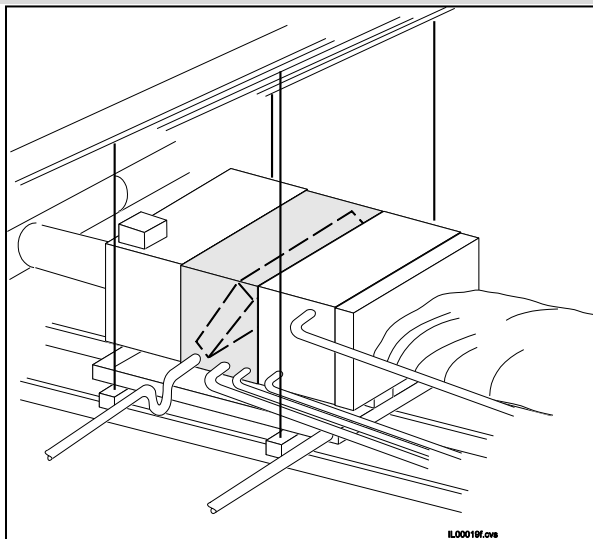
Horizontal installation with *Unico System* Heating Module and Blower Module
